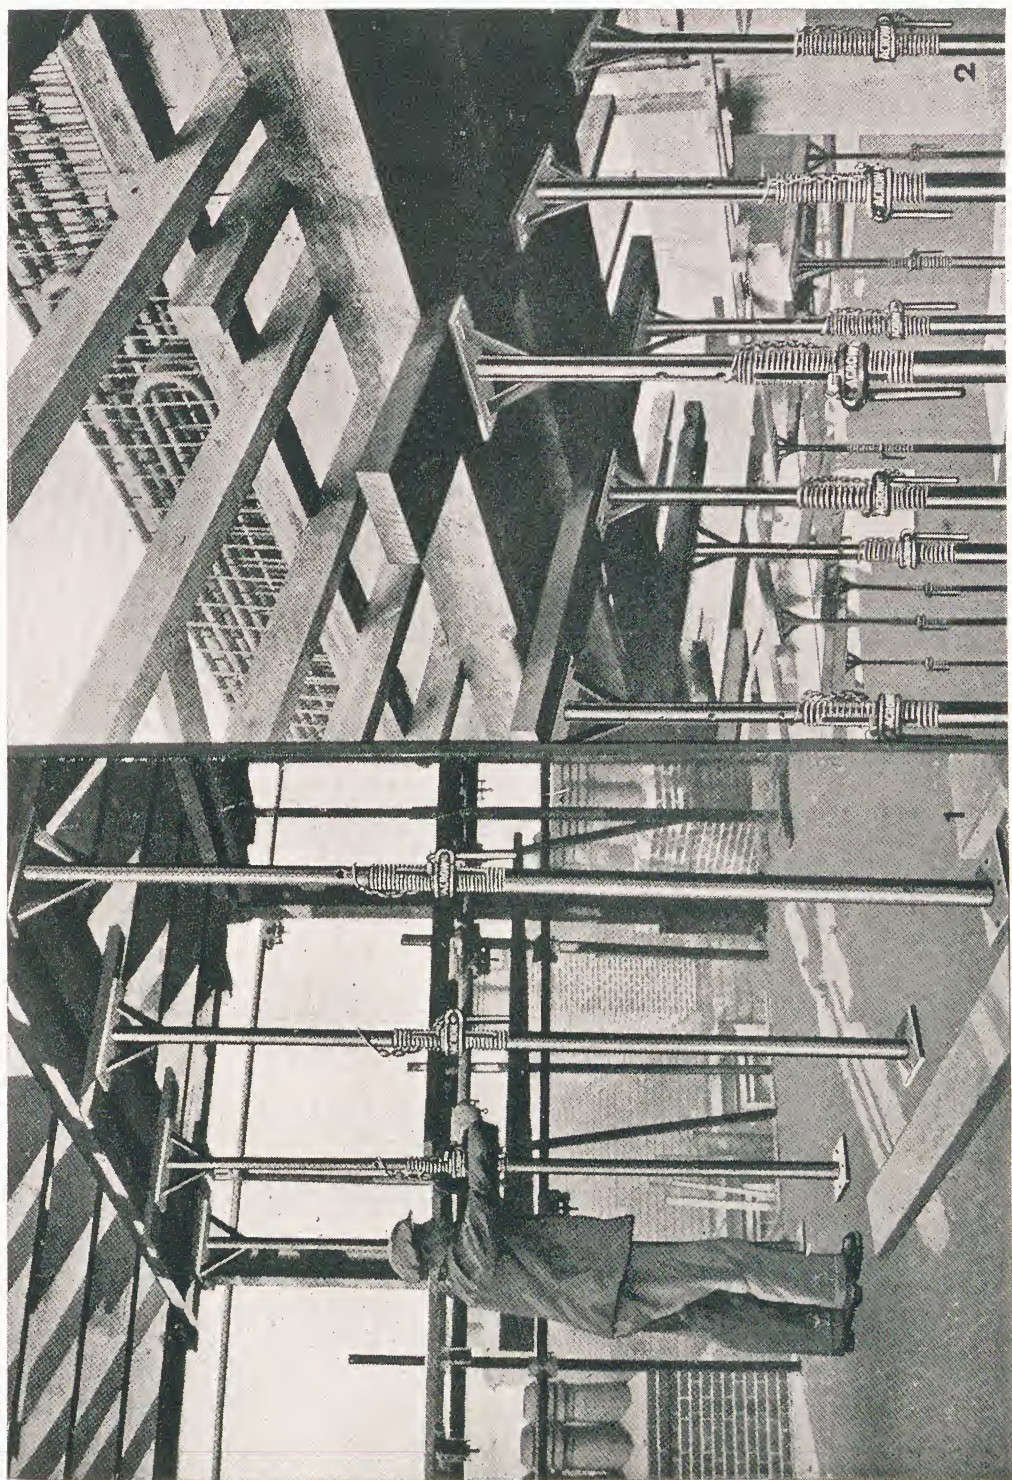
(Left) ACROW ADJUSTABLE STEEL PROPS. (Right) ACROW BEAM PROPS IN HEAVY CONSTRUCTION.
